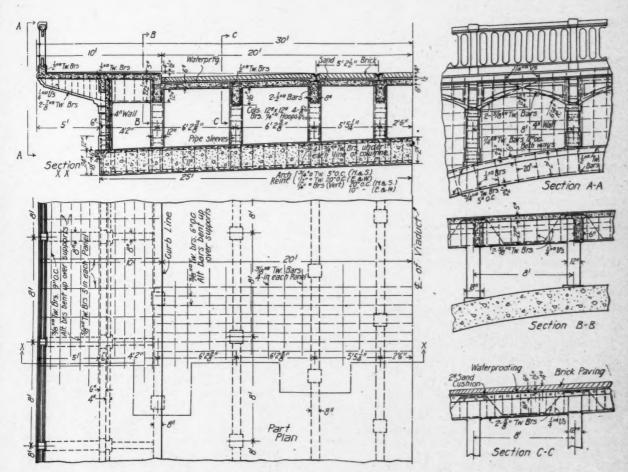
Details of Deck and Spandrel Construction Over Arches.
